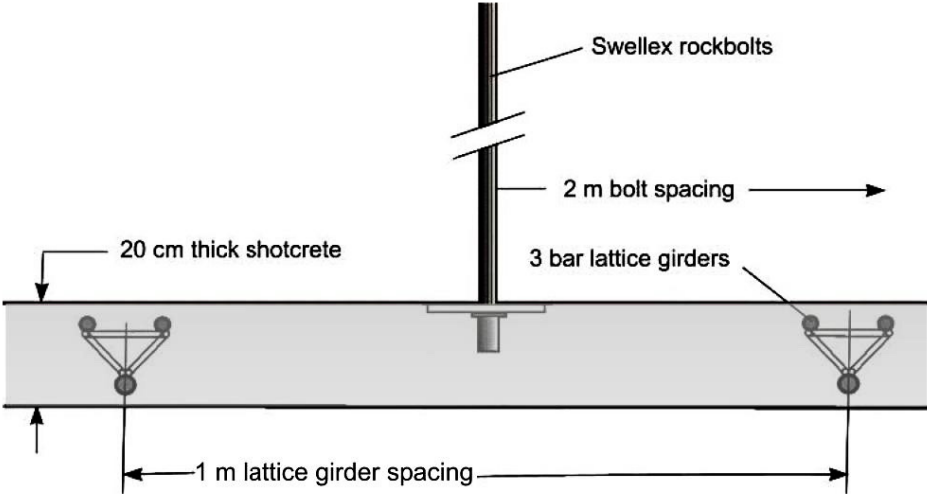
Reinforcement and support for the top heading arch consisting of standard Swellex rockbolts on a 2 m x 2 m grid and 3 bar lattice girders spaced at 1 m centers and embedded in a 20 cm thick shotcrete lining (Not to scale).
